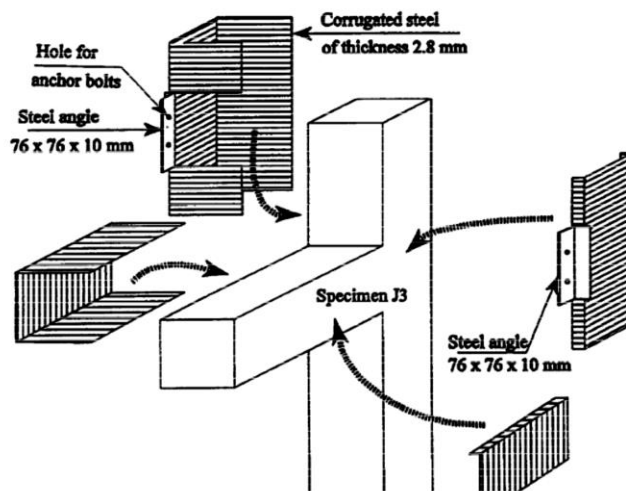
Steel Jackets Strengthening details of joint (Ghobarah et al., 1996)
